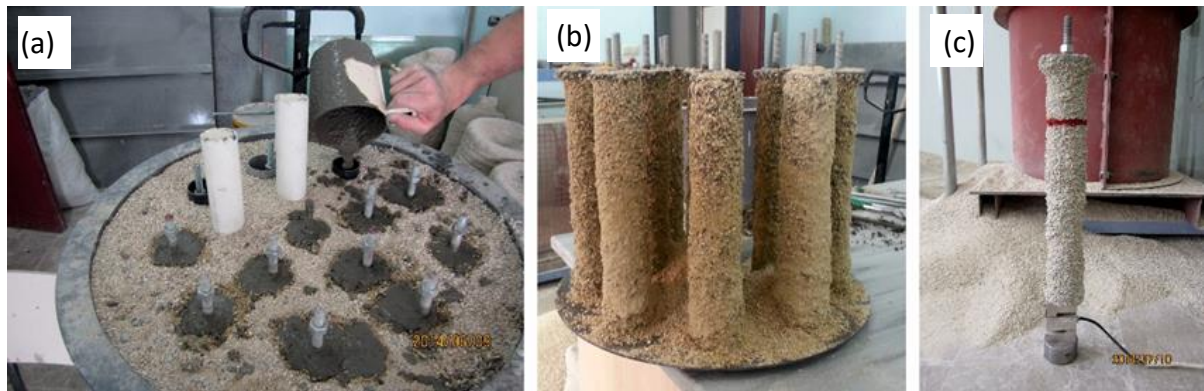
a, b) Construction of the piles in sandy soil, c) a model pile
